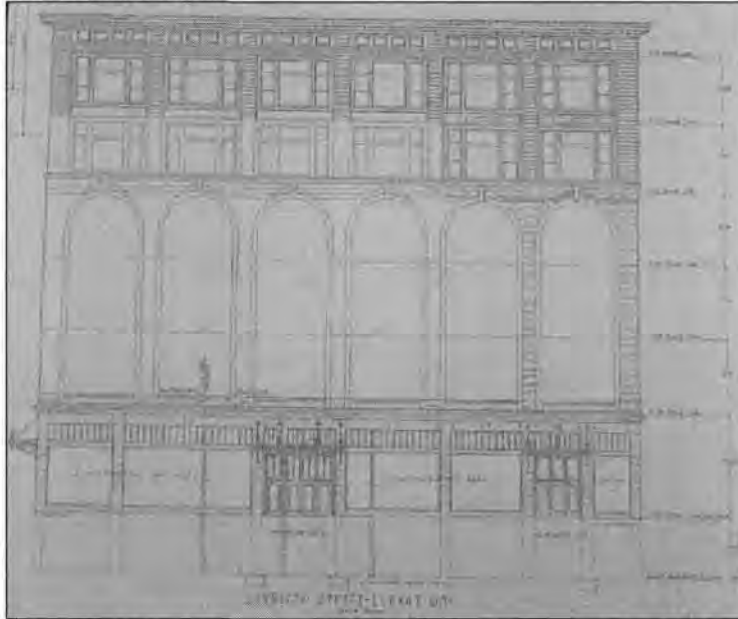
east façade elevation, east building, new entrances (see Figure 3)
